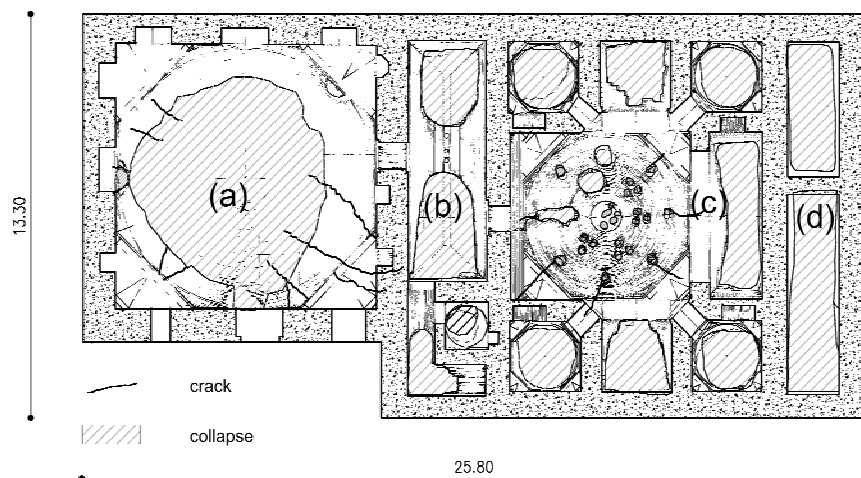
Ceiling plan: cracks and collapses are denoted.
